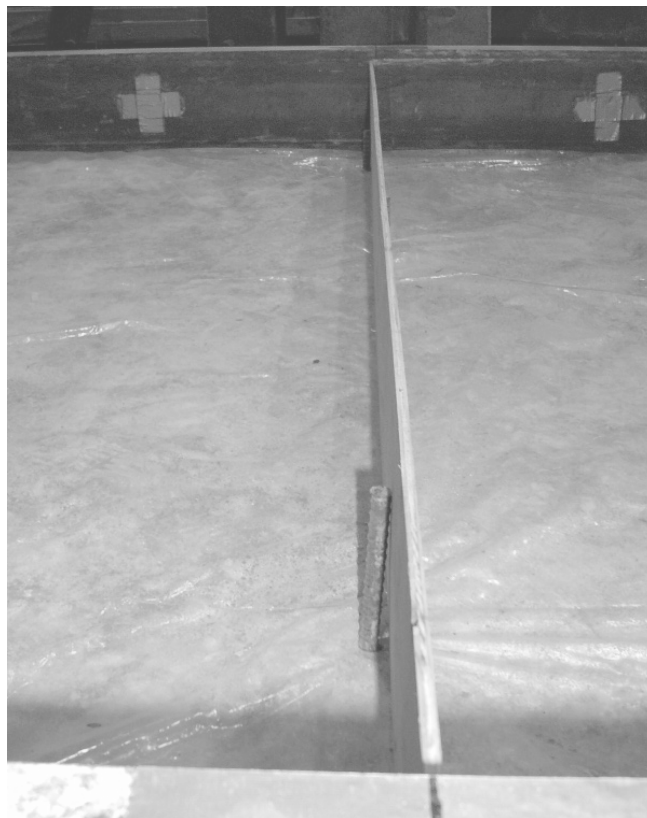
CLOSE-UP OF SMOOTH FORMED JOINT
